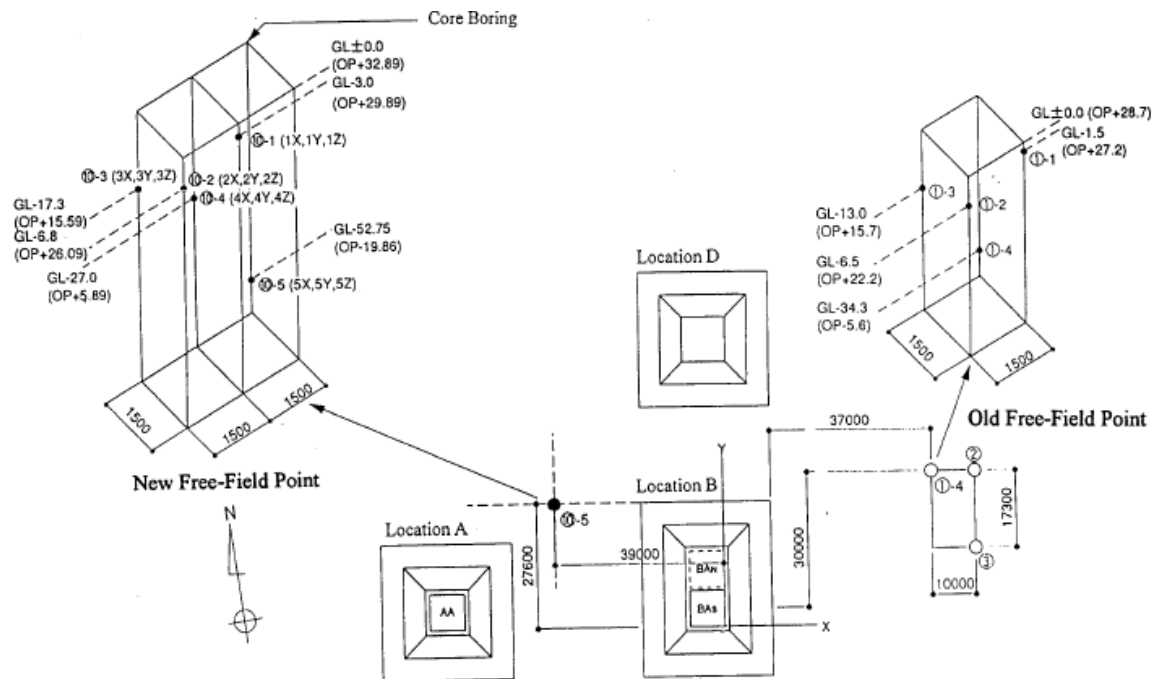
Layout of Test Site (Xu et al. 2003)
